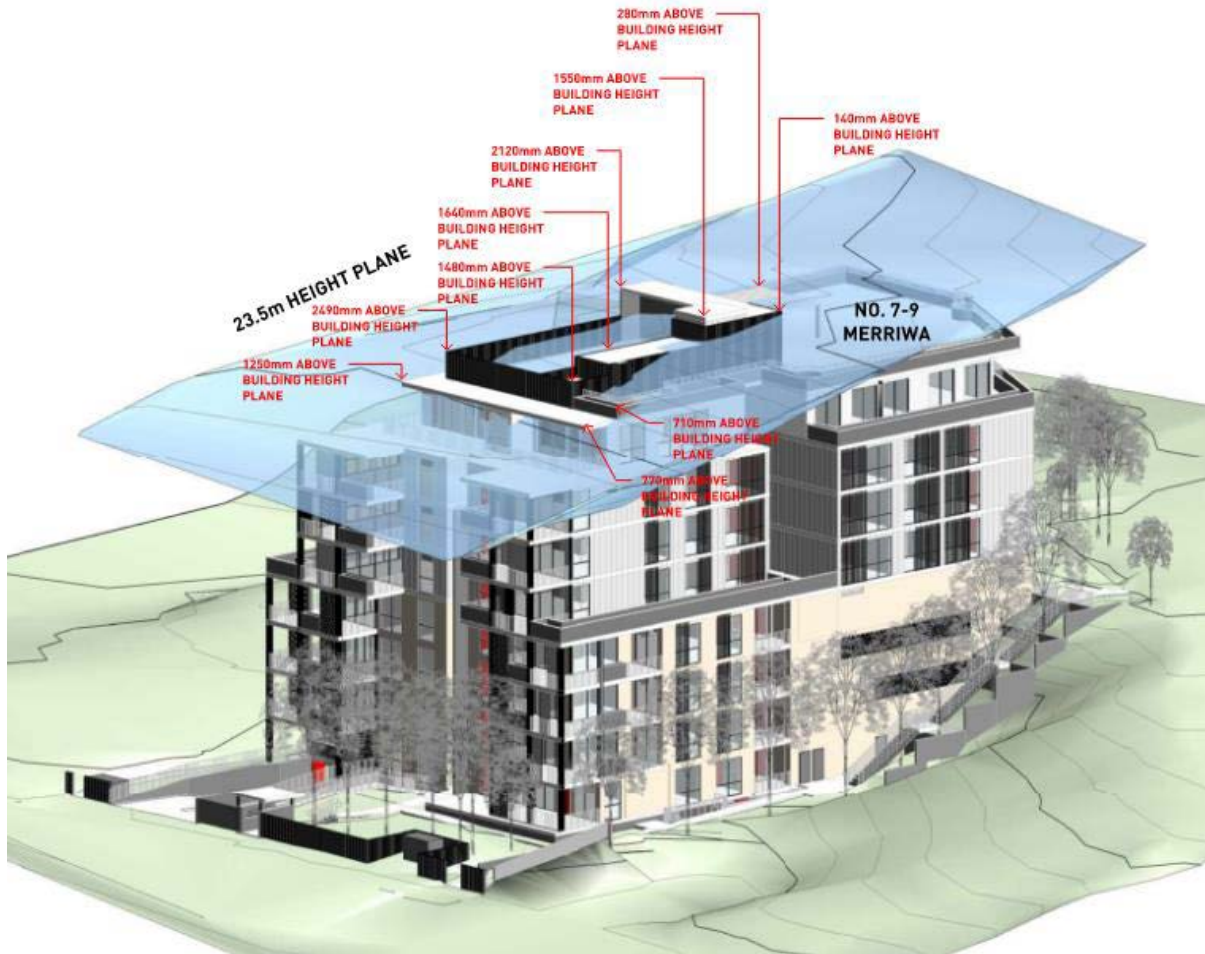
Maximum height variation shown as “2490mm above building height plane” in the SW corner (source: Clause 4.6, revision C Mecone 2025).
